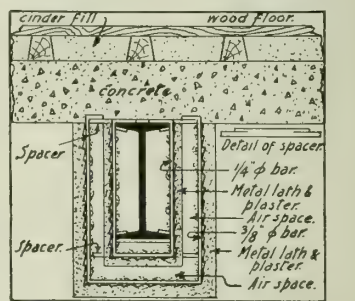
DOUBLE WALL PROTECTION, CLASS A
